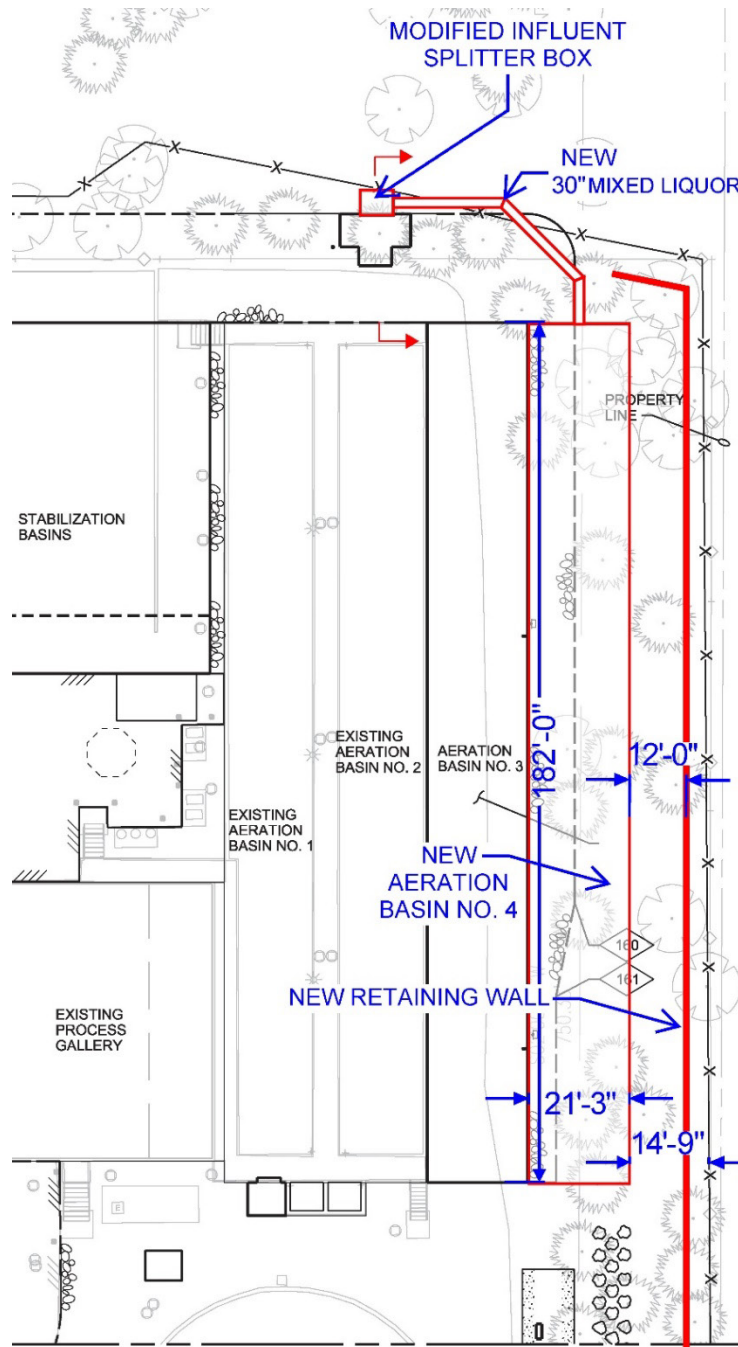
Proposed Fourth Aeration Basin Site Plan
